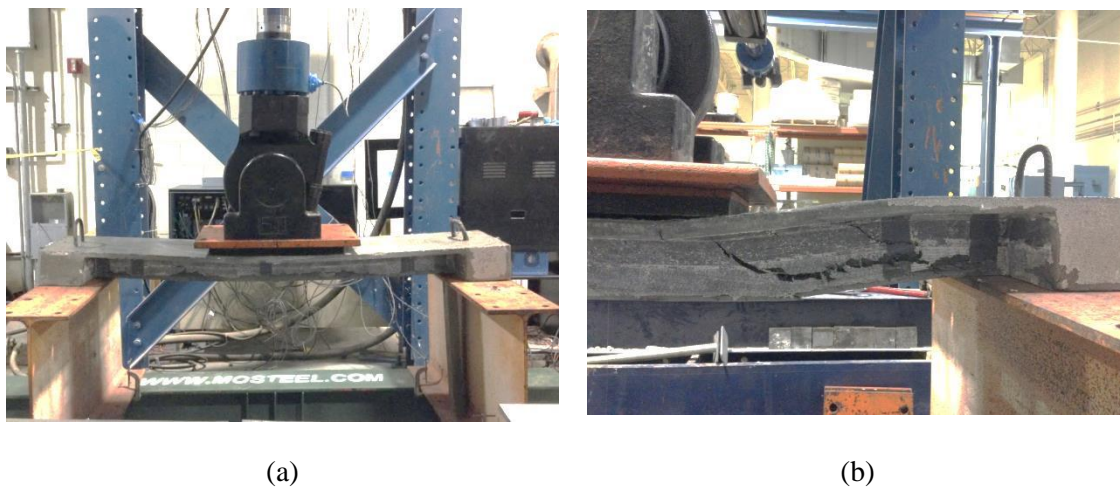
Flexure Test and Failure Mode of Specimens 1T1S-HSS, (a) Deflected Shape of Specimen 1T1S, and (b) Beam Shear Crack
